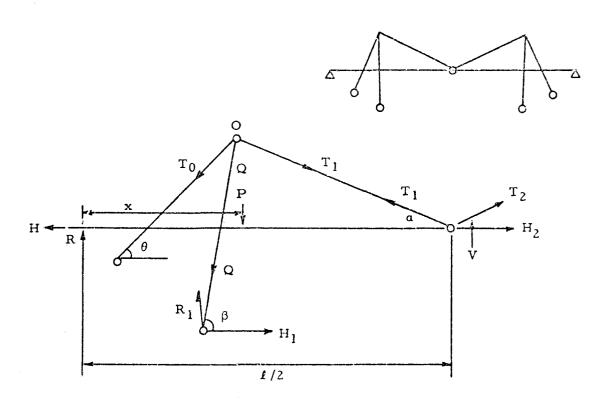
LEANING PIERS BRIDGE, ELEVATION VIEW
